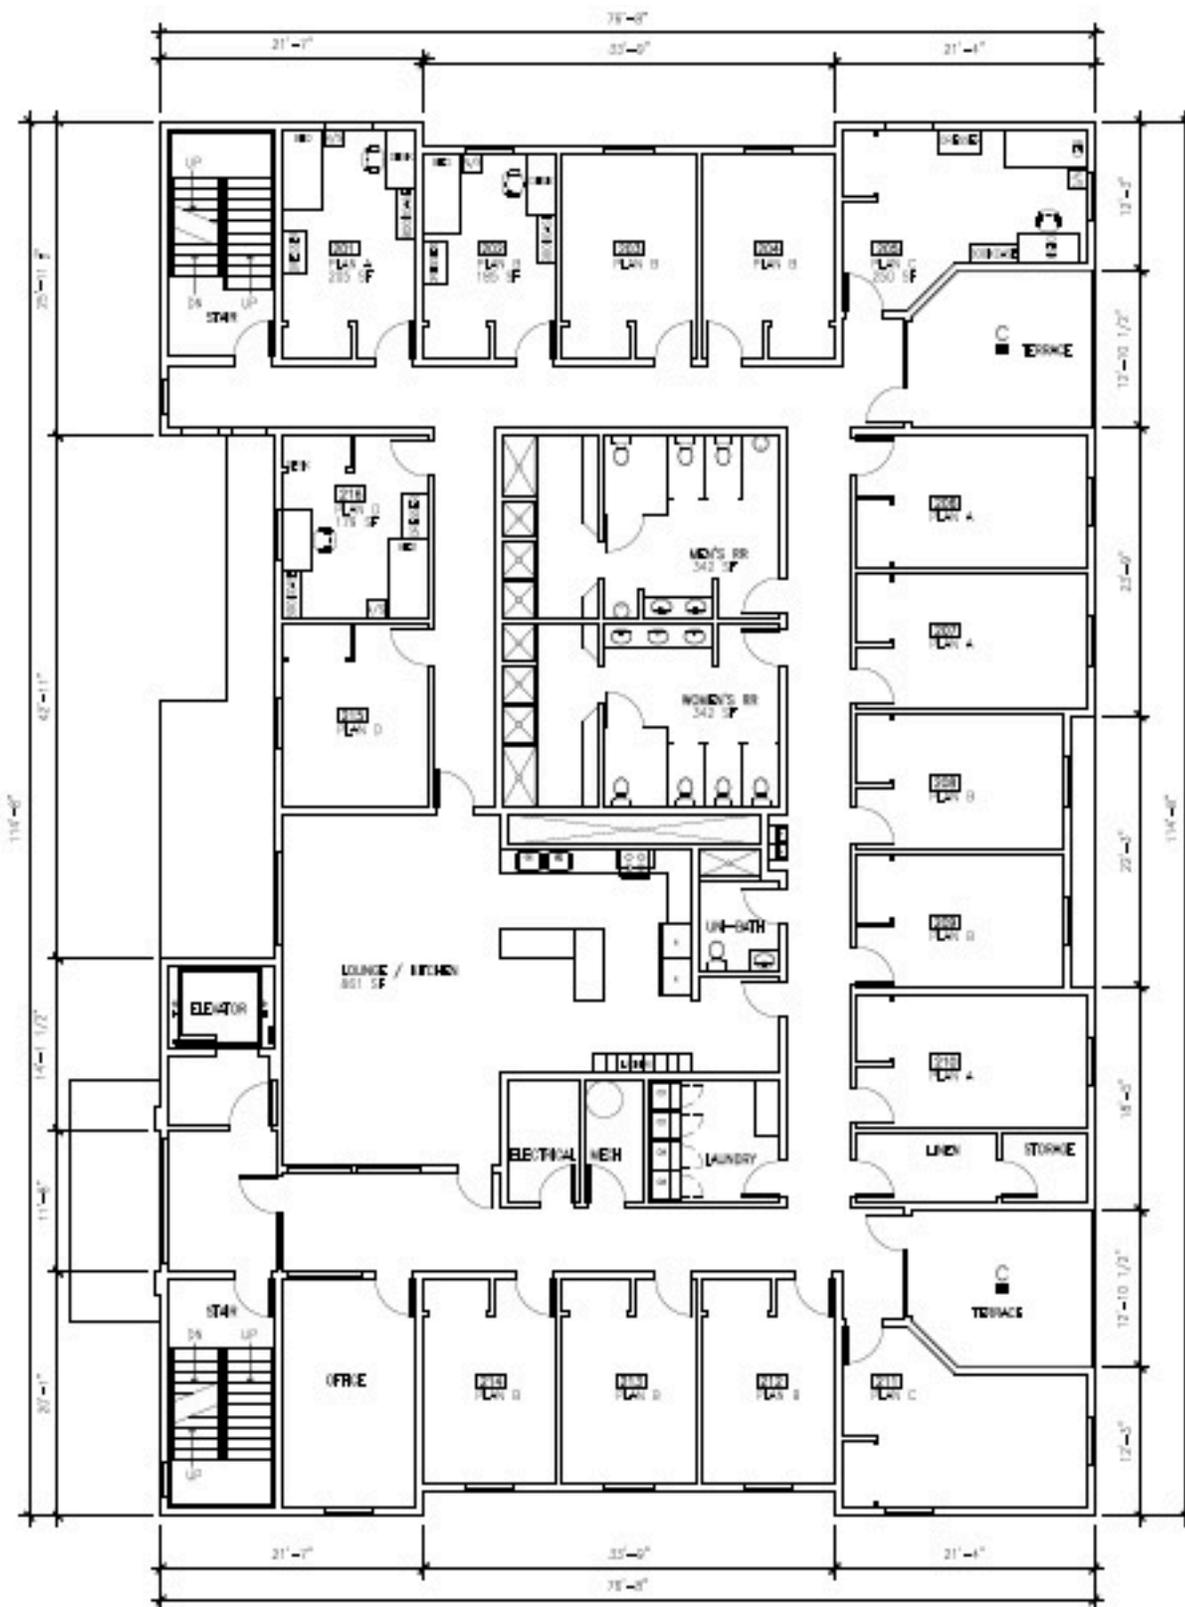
PROPOSED SECOND/THIRD FLOORS/SUPPORTIVE HOUSING
